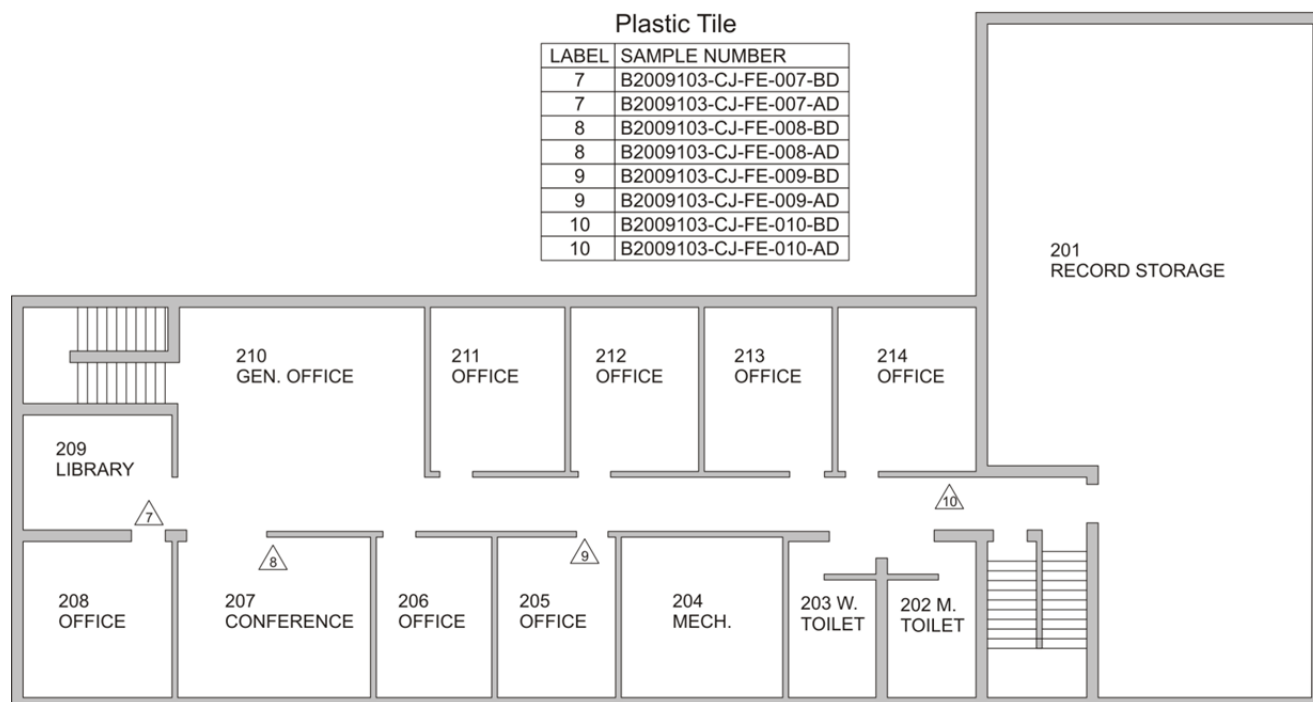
B2009103 Admin Building Direct Survey Locations Second Floor
